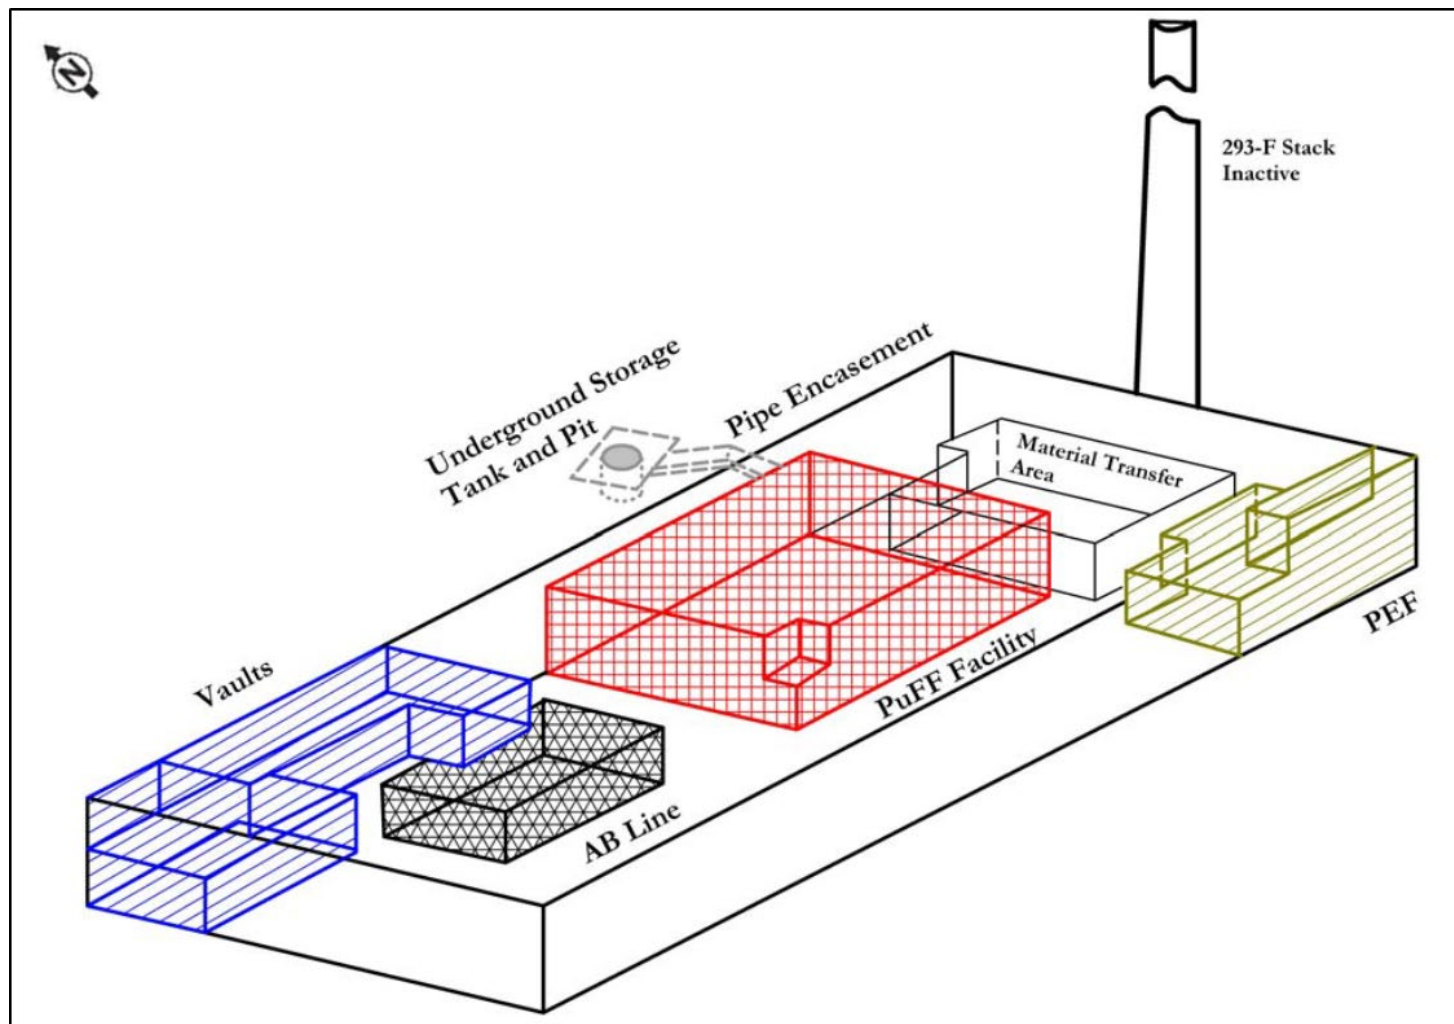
Conceptual View of Building 235-F First and Second Level Process Areas
